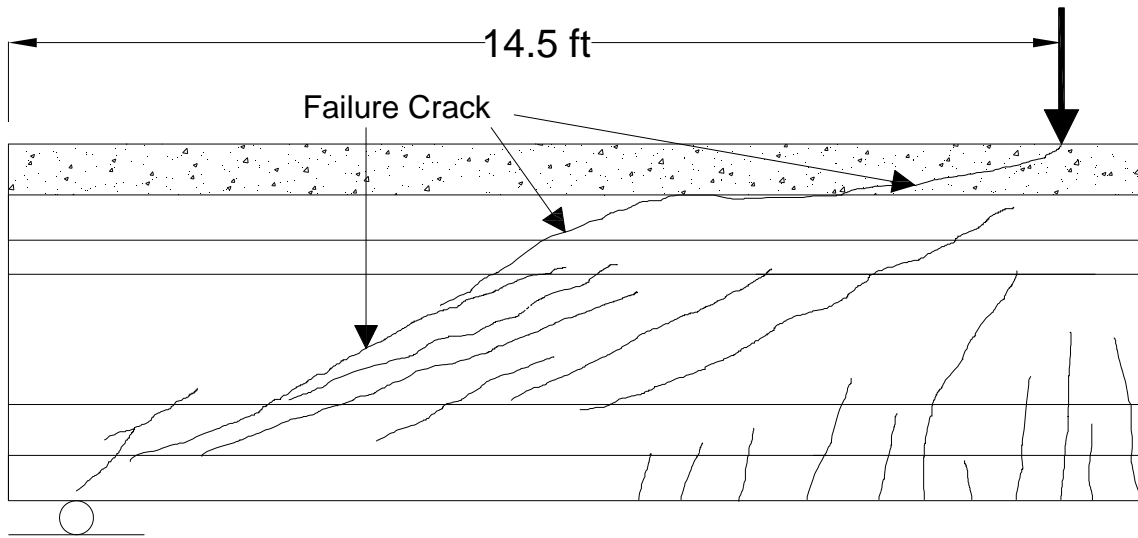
Cracking at 40% Past Peak Applied Load (Specimen I)
